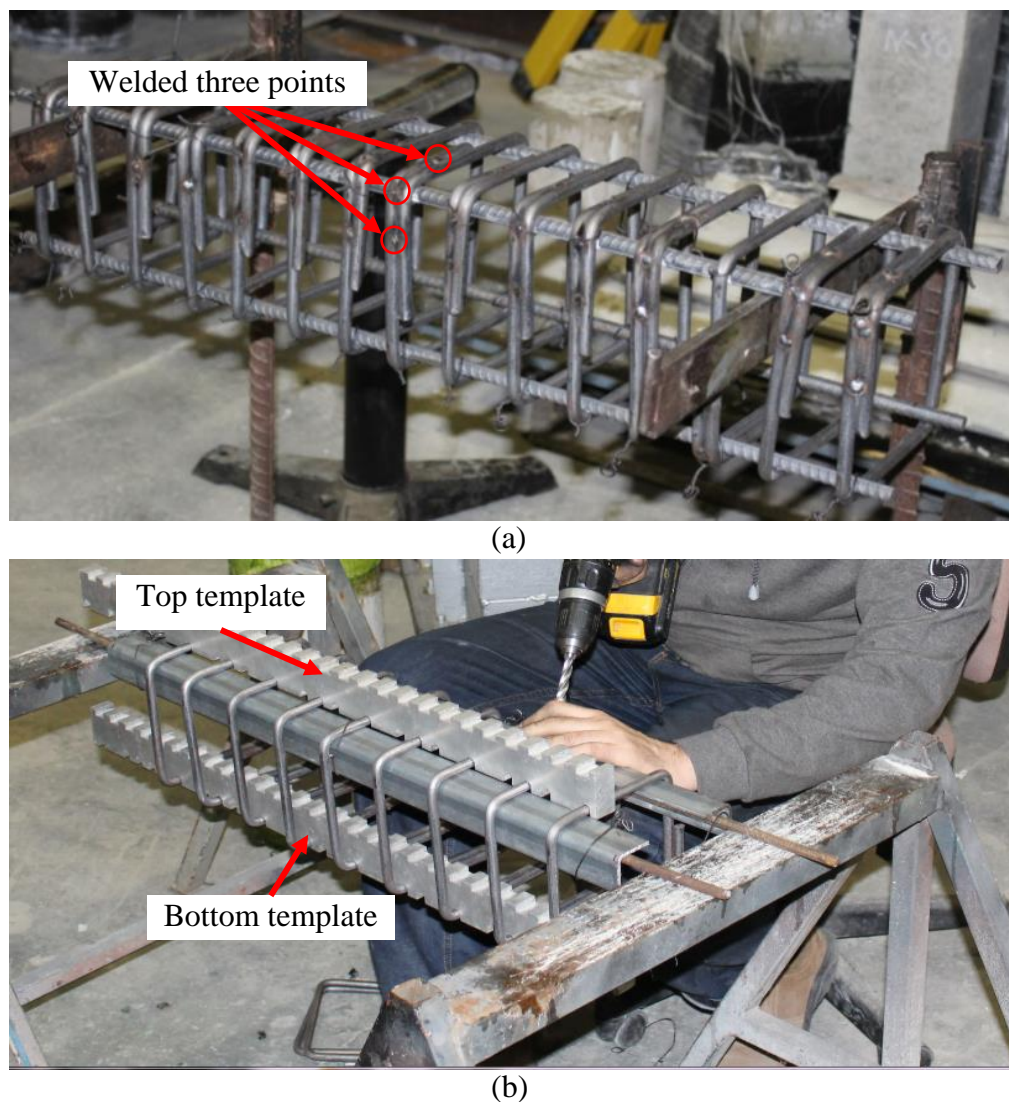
Placing the steel cages: (a) longitudinal steel bars and (b) longitudinal SEA sections
